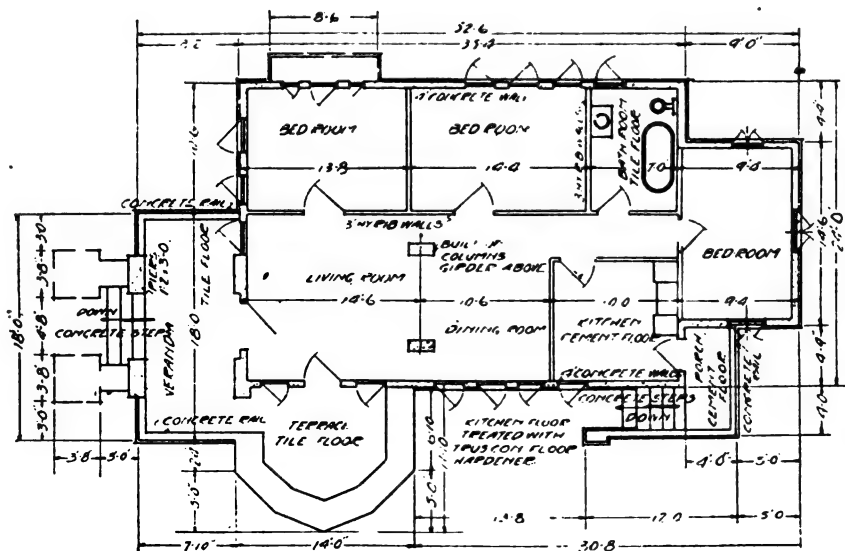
FLOOR PLAN OF BEHN BROS. HOUSE
